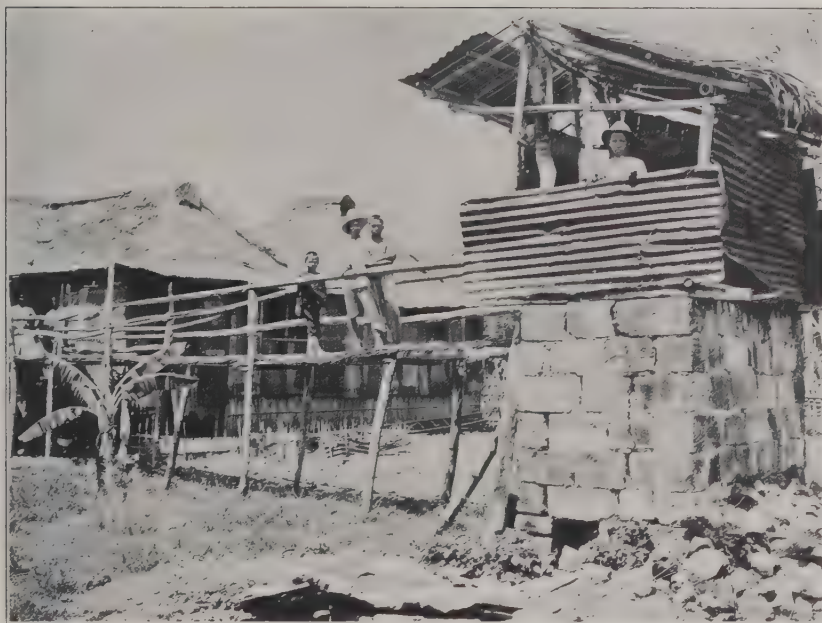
OUTHOUSE WITH BRIDGE FROM HOUSE.
